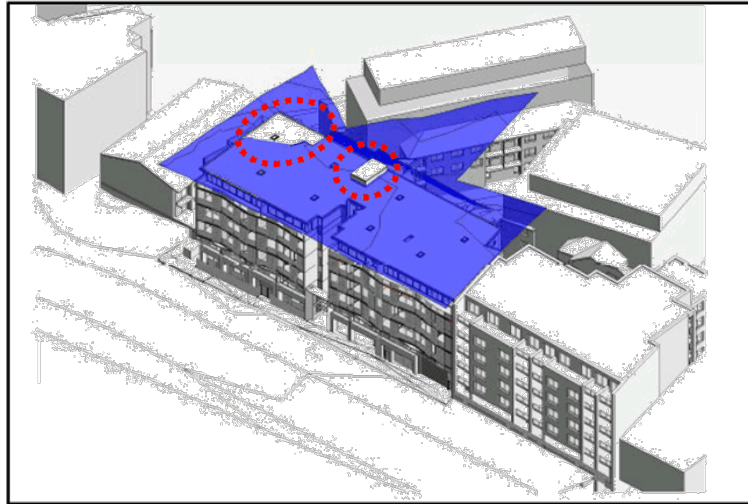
Extract of the building height plane showing the elements of the built form that site above the LEP 19m height line
